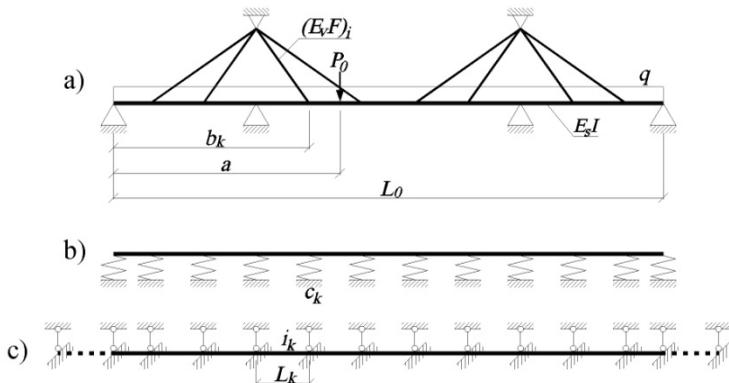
a – bridge layout, b – design layout, c – displacement method base layout
